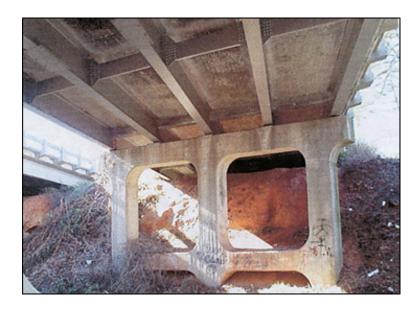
Structural elements of a typical highway bridge (MDOT 2018)
